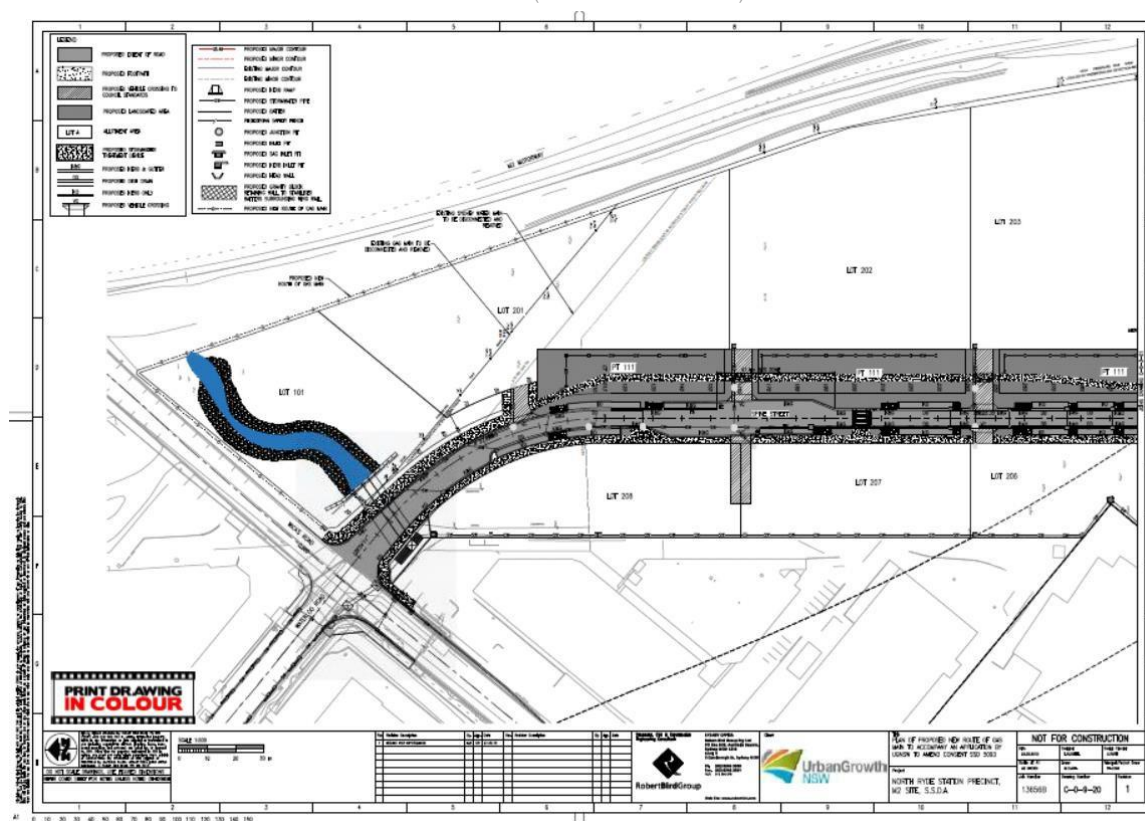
APPROVED GAS MAIN RELOCATION (REFERENCE: DRAWING 13656B C-0-3-00 REV 6 GENERAL ARRANGEMENT PLAN SHEET 1 OF 2)
